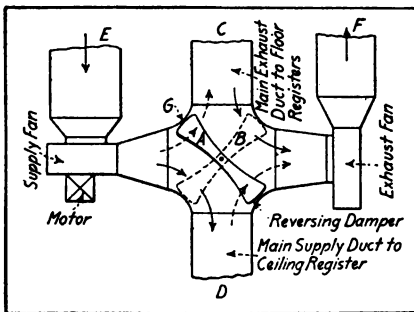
SATISFACTORY FORM OF REVERSING DAMPER
